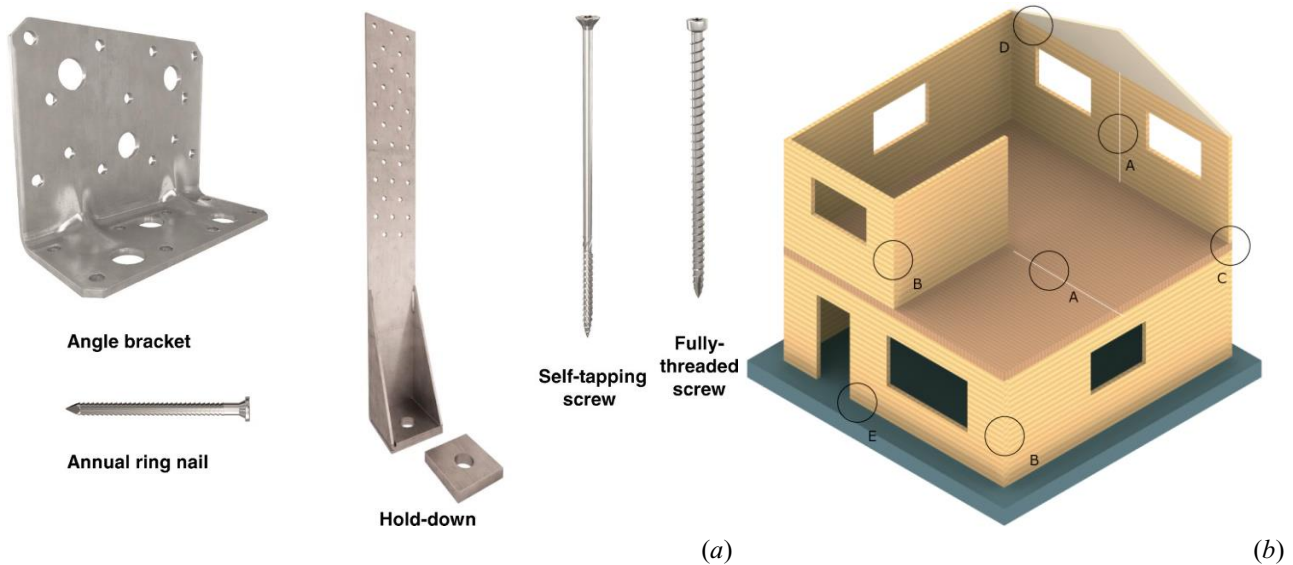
Connection system for CLT assemblies: (a) example of connectors used with angle bracket and hold-down connections and (b) location of connections in multi-storey CLT buildings and their detail ID henceforth adopted. (images credits: (a) Gavric *et al.* [77] and (b) CLT Handbook [39]).
